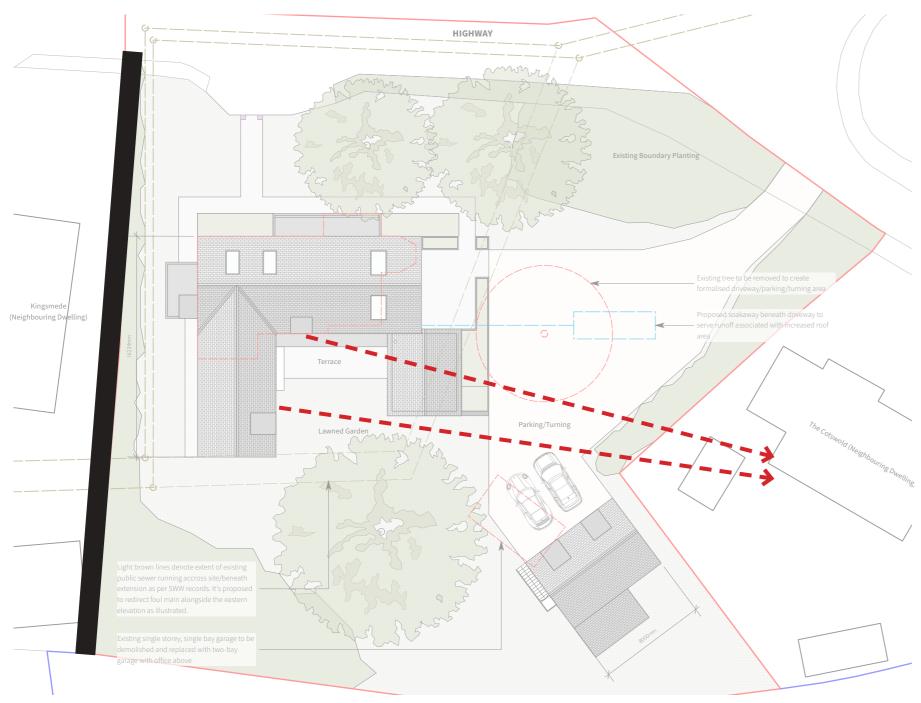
Proposed Site Plan (overlooking diagram)
